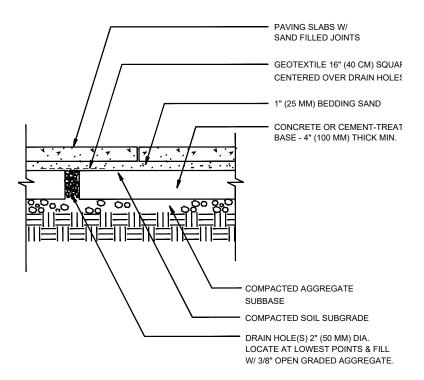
Typical cross section of sand-set paving slabs on a concrete base
